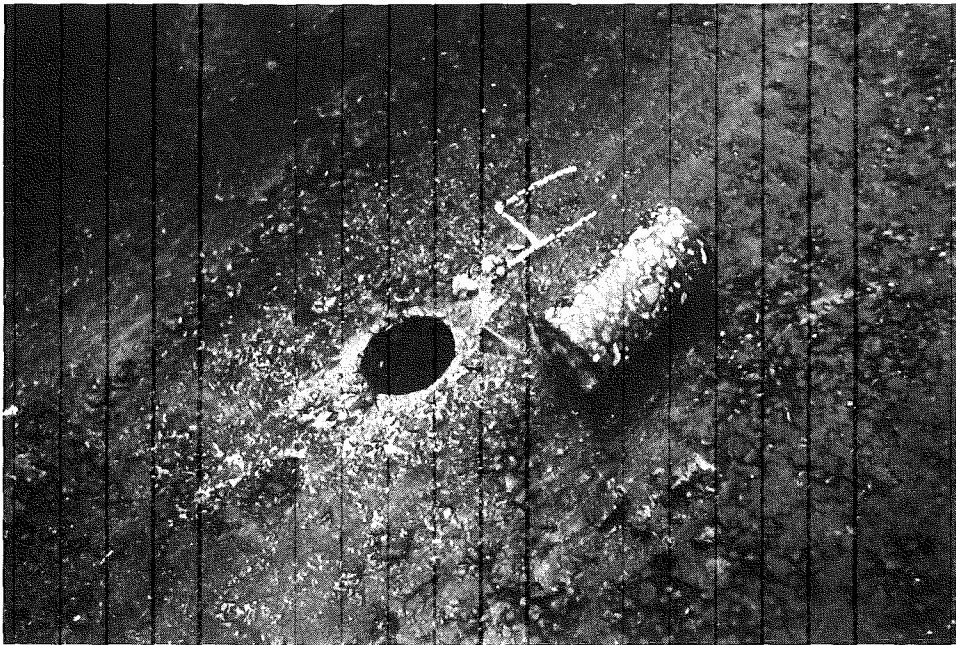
Taking a sample out of a asphaltic concrete revetment by core boring
